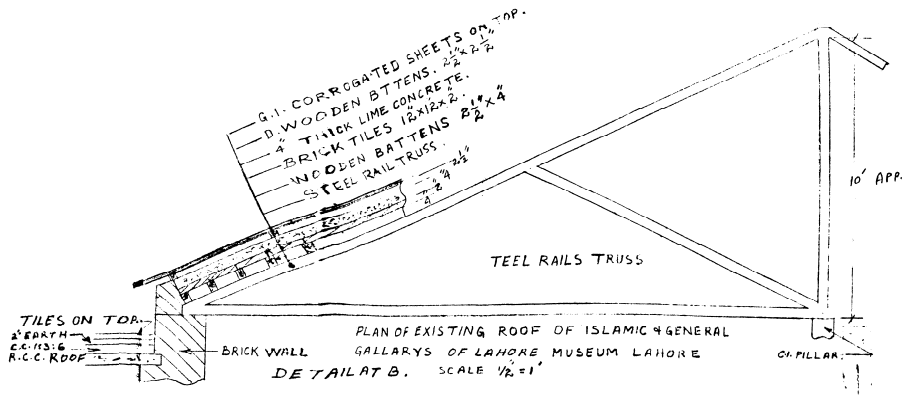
Section through the General Gallery Roof – Existing (1980)
